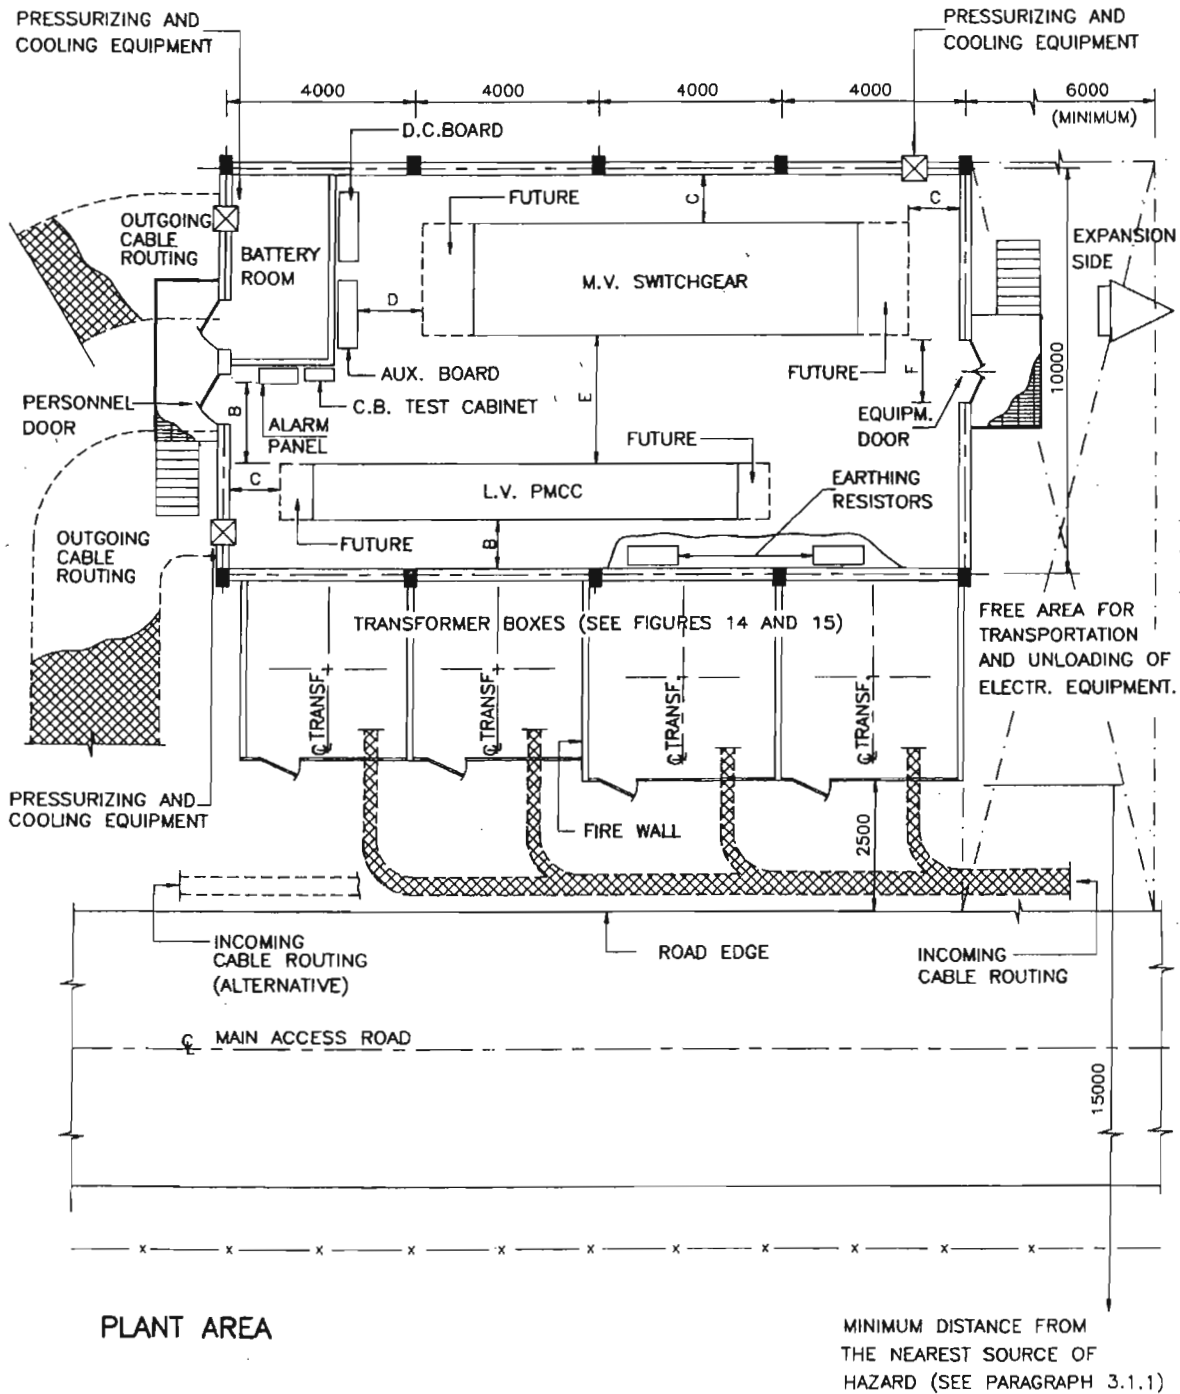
LAYOUT–L.V.& M.V. TAPPED FEEDER SINGLE ENDED SUBSTATION
